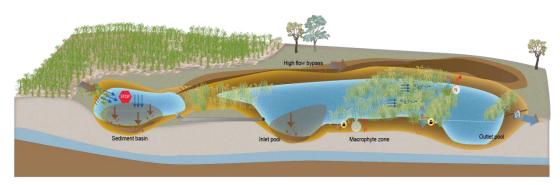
Functional layout and shape requirement. (Source: adapted from 'Treatment wetlands – Planning and design', Wetland Info 2018)
